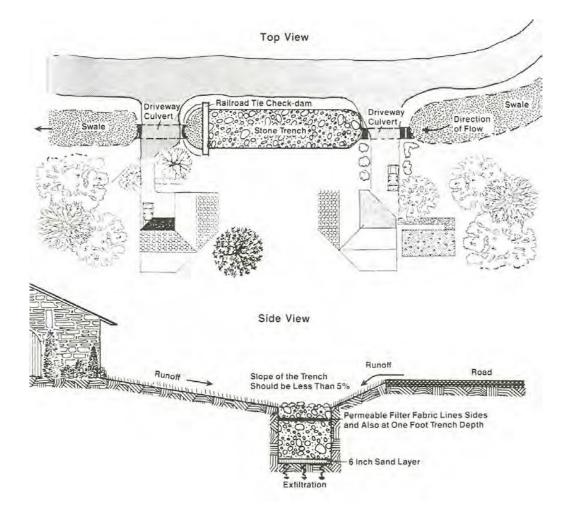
S2- 8: Swale/trench design (residential application) Source: MWCOG, 1987
